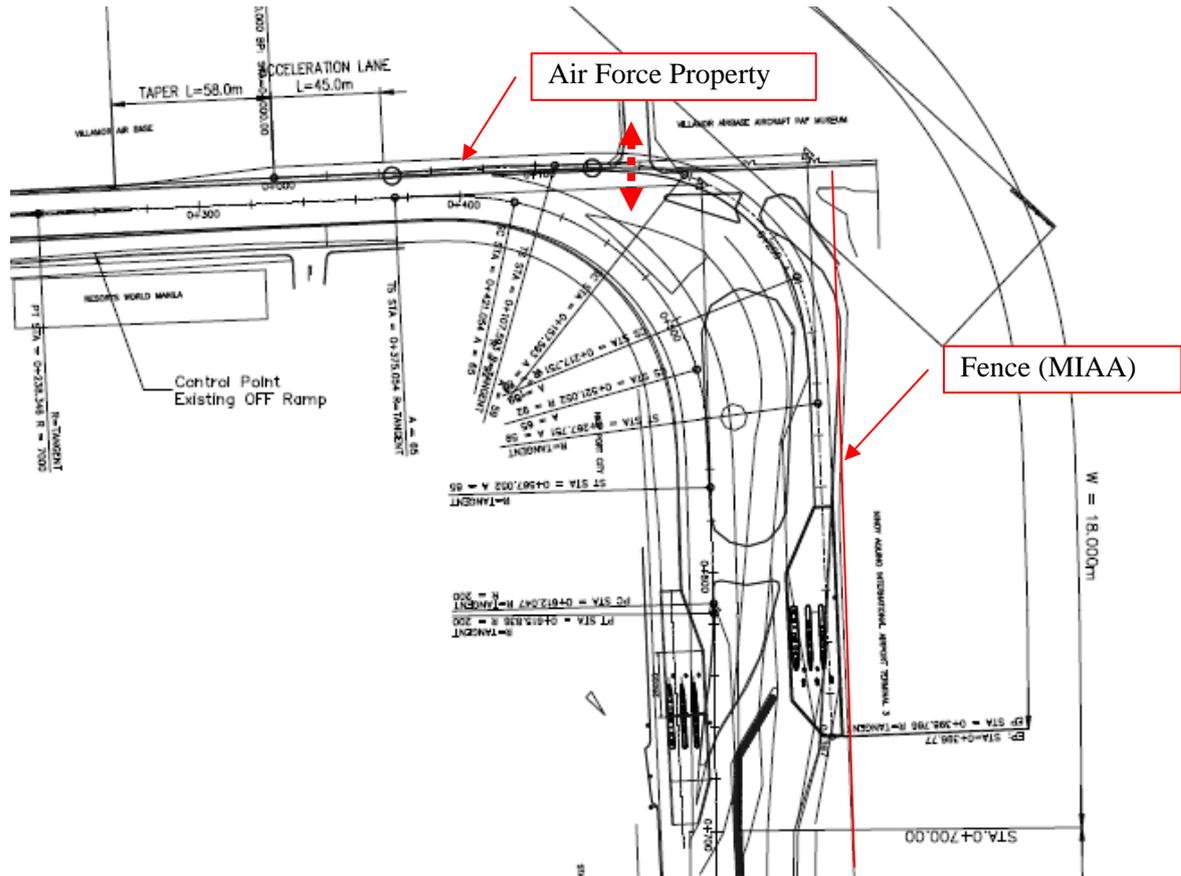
ANDREWS AVENUE ON RAMP (1)
